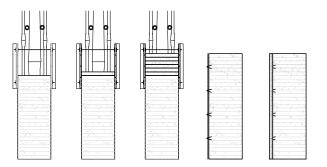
Detail construction of the facade . Rammed earth with bamboo.
